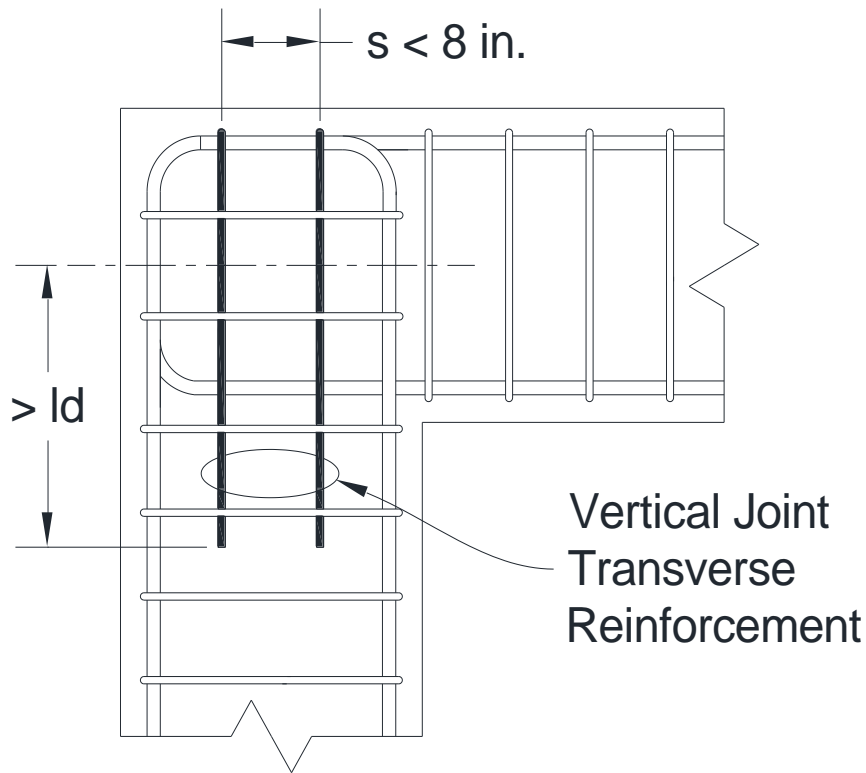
Corner joint with vertical and horizontal transverse reinforcement (adapted from ACI 352R)
